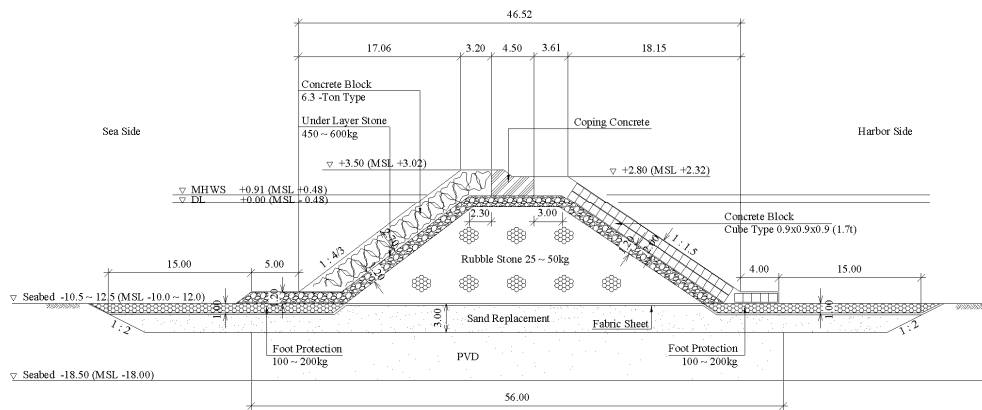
Typical Section of Breakwater in North Kalibaru New Terminal
